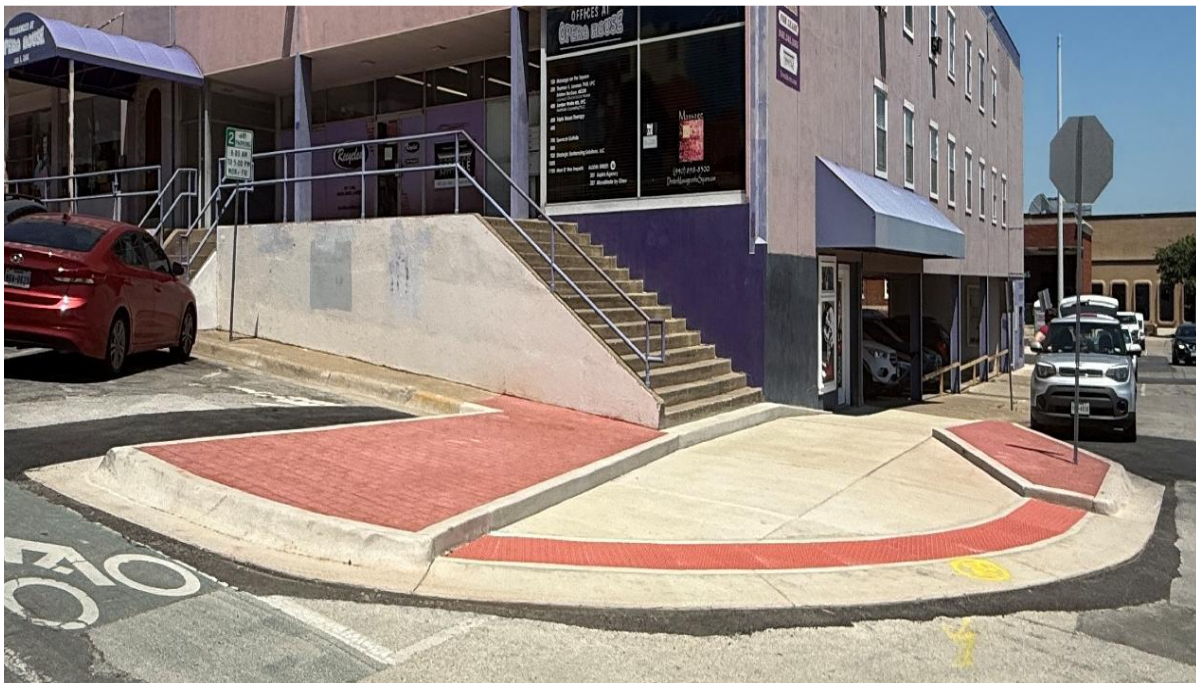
E Oak and N Austin St intersection (SE corner – After Installation)
